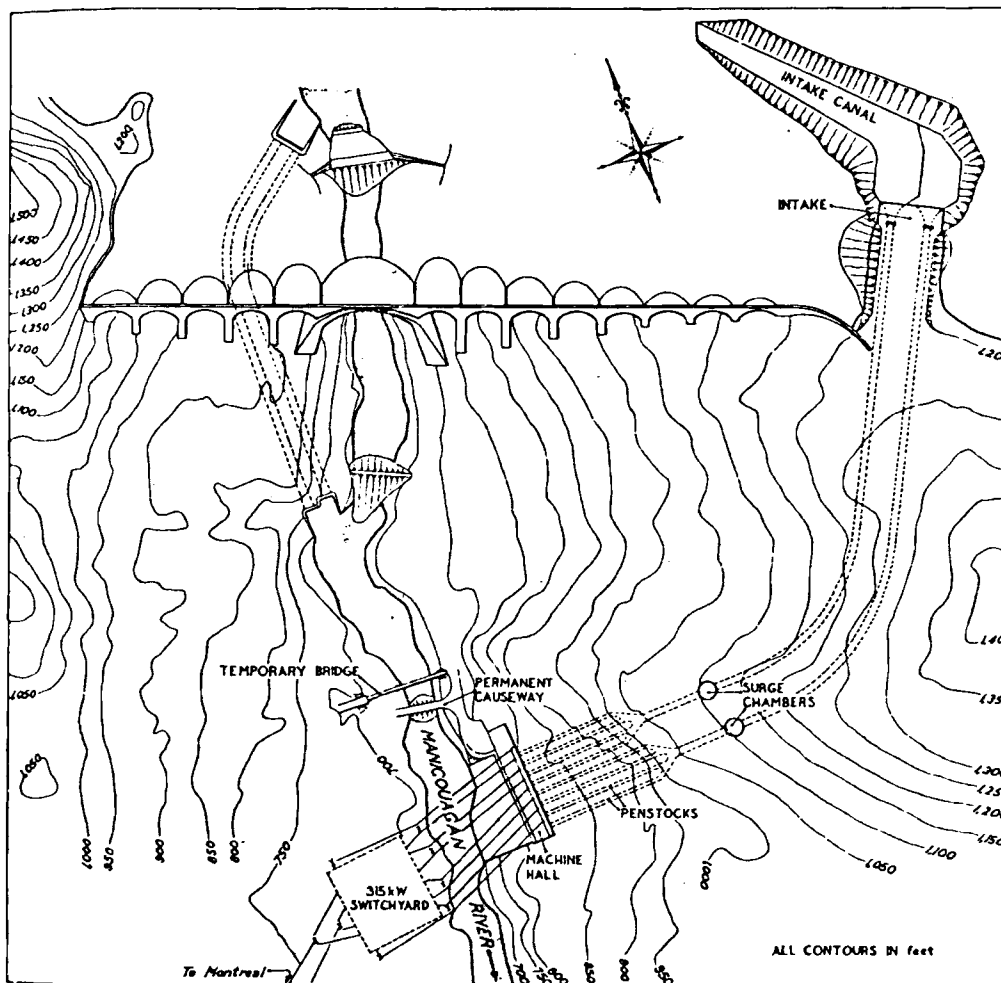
Plan of Manicouagan 5 multiple arch dam (Daniel Johnson dam), Manicouagan, Quebec, Canada (owner Hydro Quebec, Montreal, Canada), crest height 214 m, tallest multiple arch dam. (From Water Power 16 (1964), no. 10 p. 410; no. 11; p. 463).
